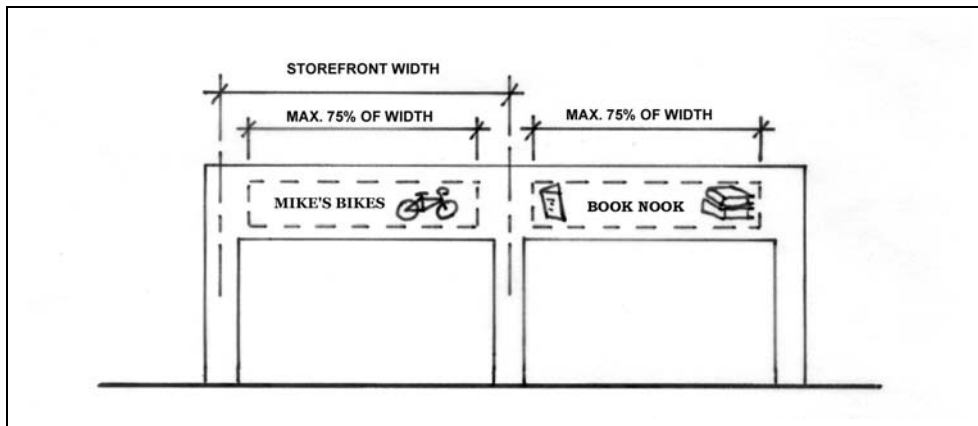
Multi-Tenant Building-Mounted Sign
